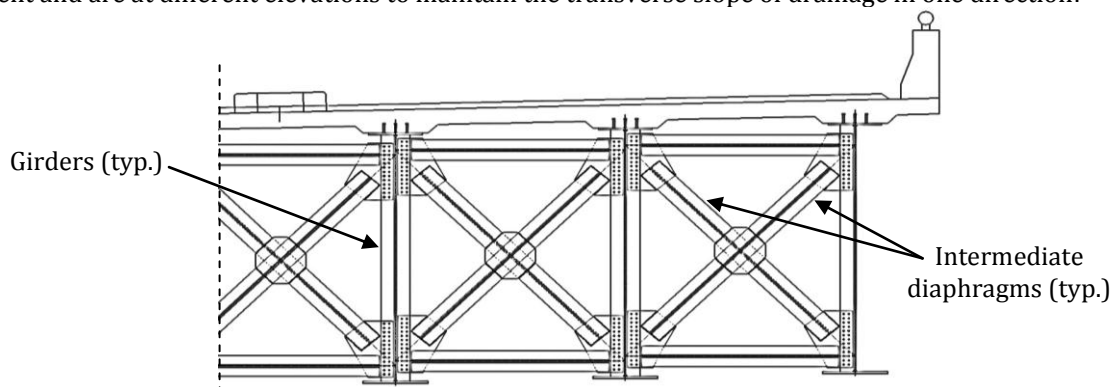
Sketch Showing Arrangement of Intermediate Diaphragms
